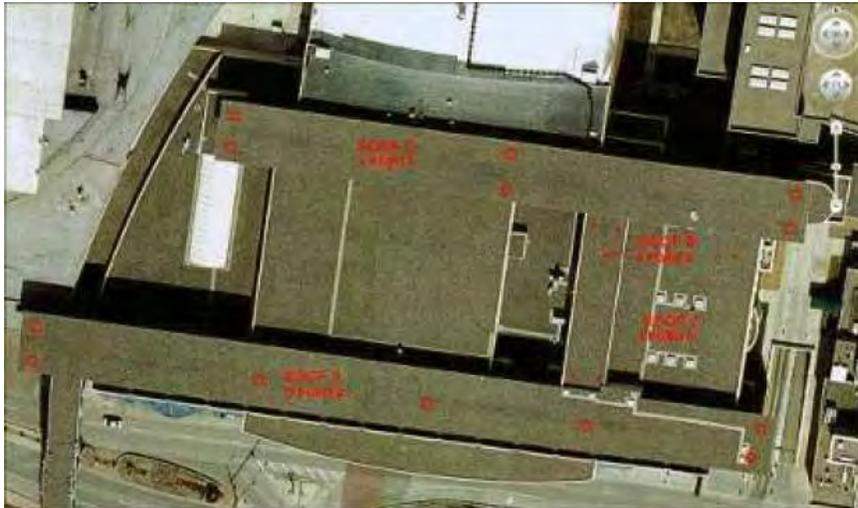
Saint Paul RiverCentre pre-installation aerial view.
